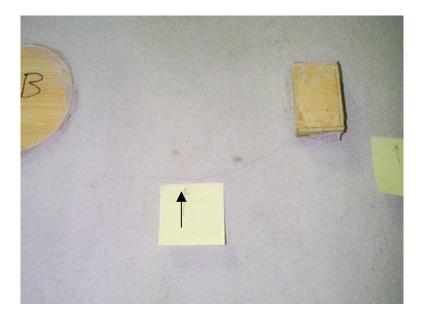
Crack between duct and electrical outlet openings (see arrow on sticker)
